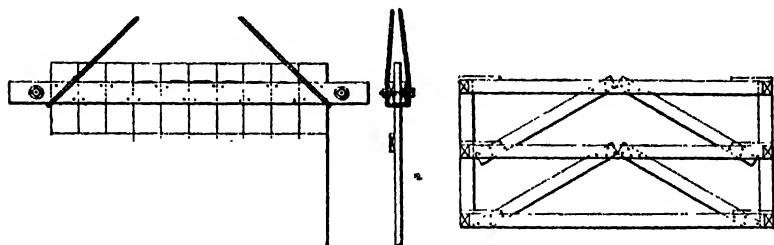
b*.—A Side Panel and Frame of Cofferdam.
